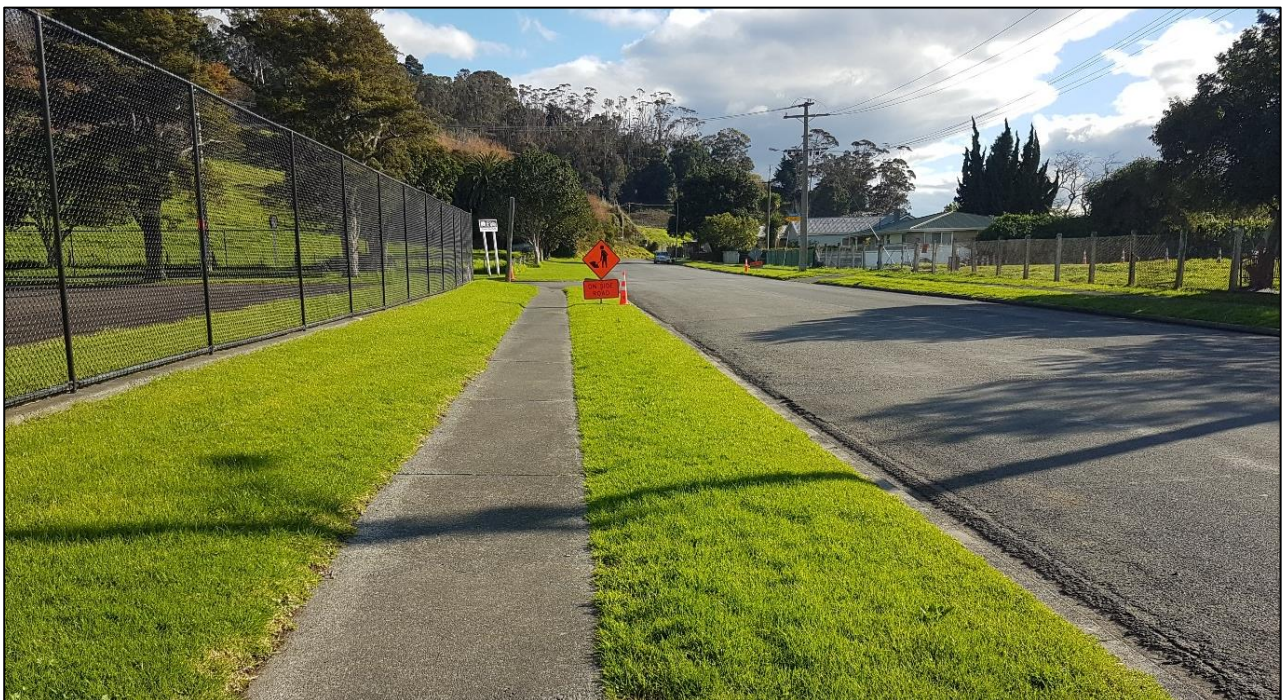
Looking left along Ranfurly Road from the access. Sight distance is 180 m.
